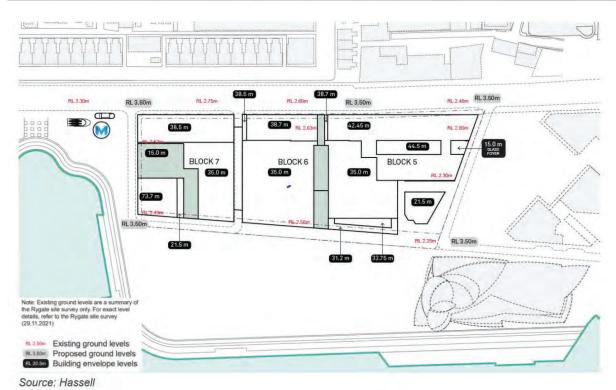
Proposed Barangaroo Concept Plan MOD 9 - Building Envelope Plan (Urbis, 2021, p. 10)
